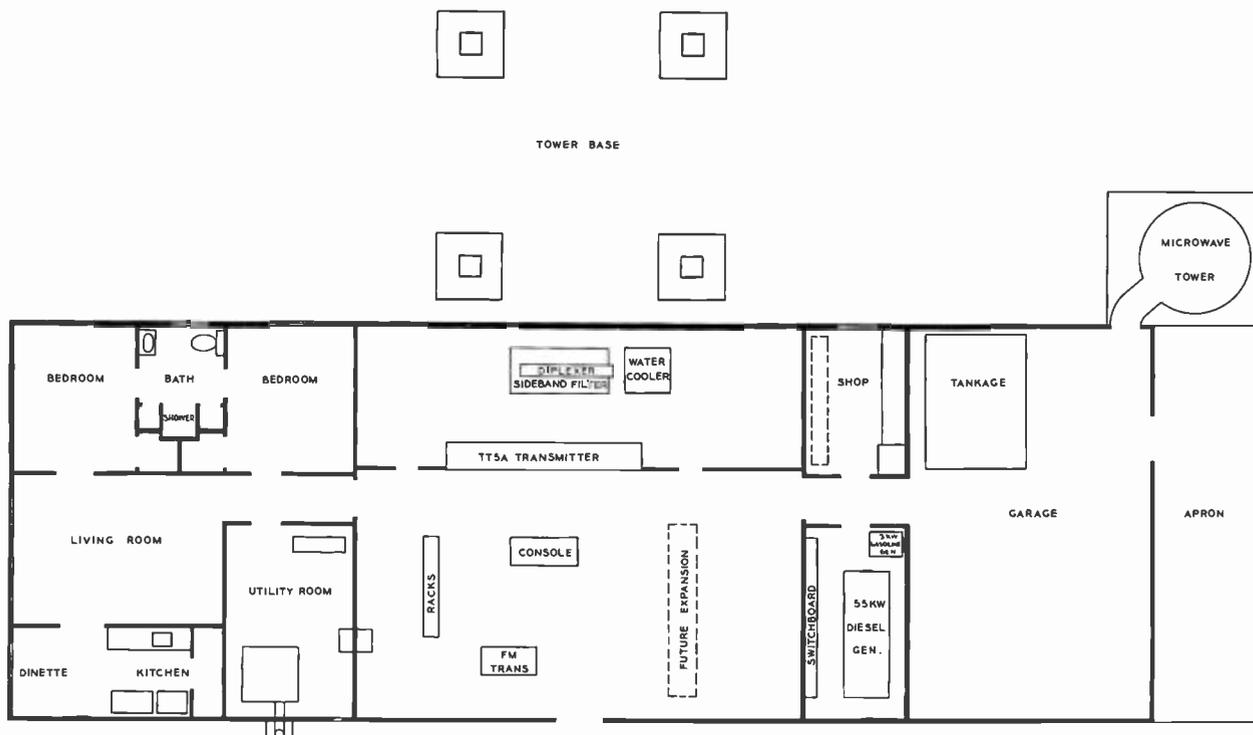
Floor plan of the KDYL-TV transmitter building on Mt. Vision. The antenna tower is located as near transmitter as possible in order to keep the transmission line short. Note also that inside access to the microwave tower is provided.
